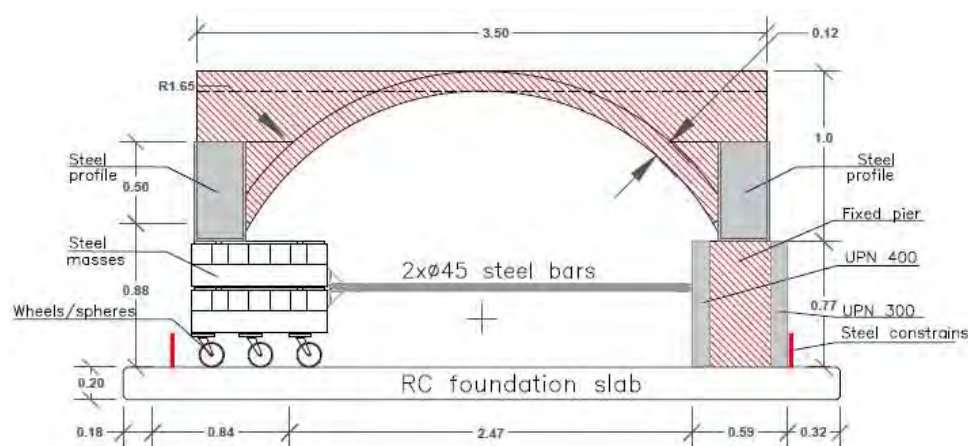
View A-A' of the model built on a RC slab fixed to the shaking table (dimensions in meters). In red the elements made of masonry, in grey the elements made of steel
